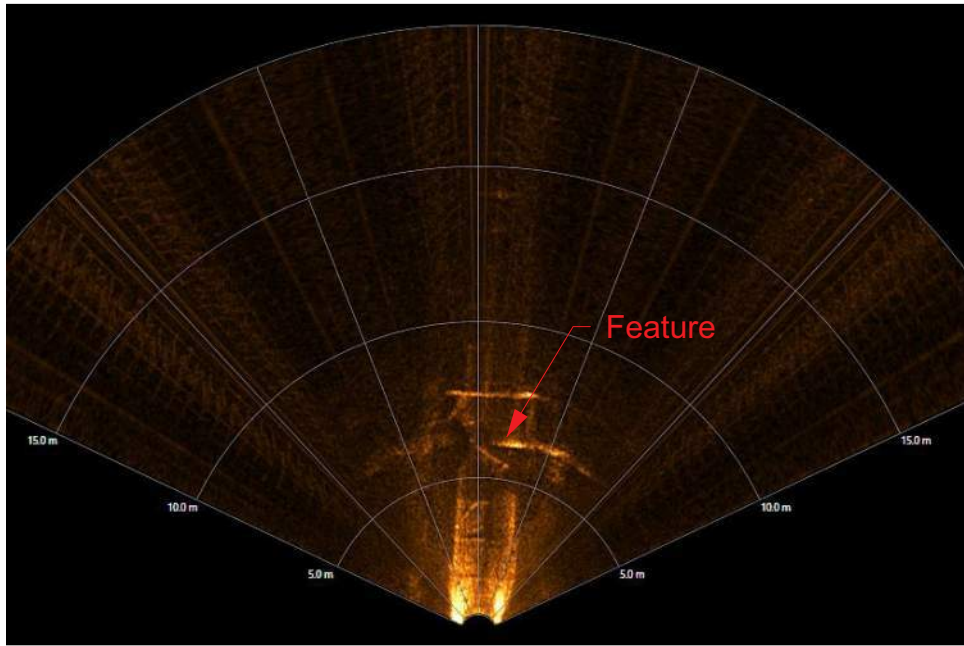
Sonar image at 136 feet downstream of Access Point 1. Feature within manhole chamber 18 feet ahead.
